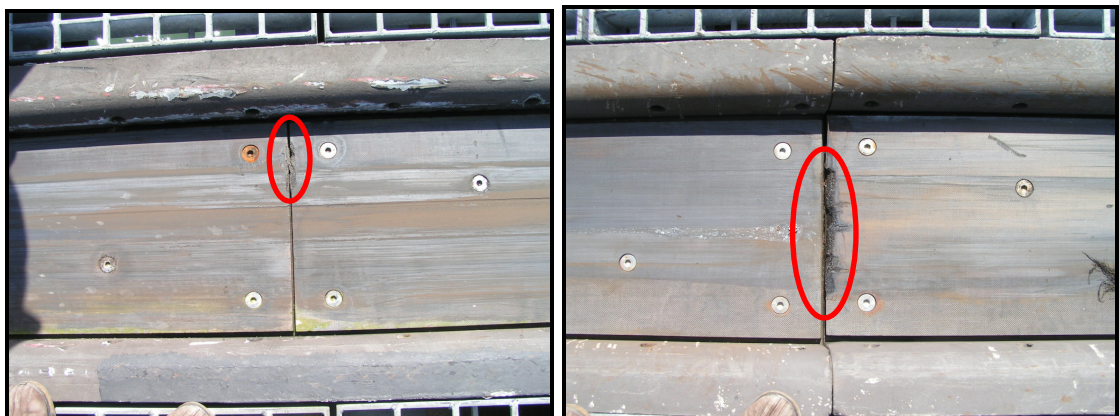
Padstow Slipway Inspection: Panel end wear
